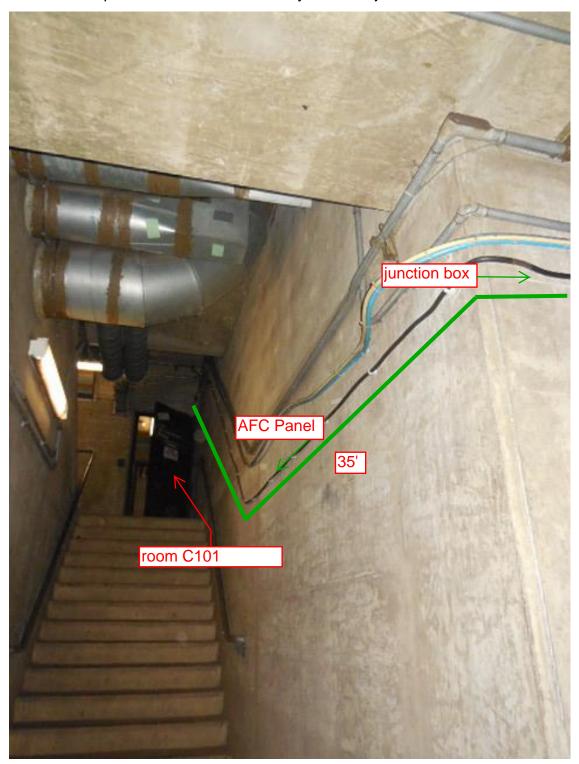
Proposed conduit run in hallway between junction box and Room C101
